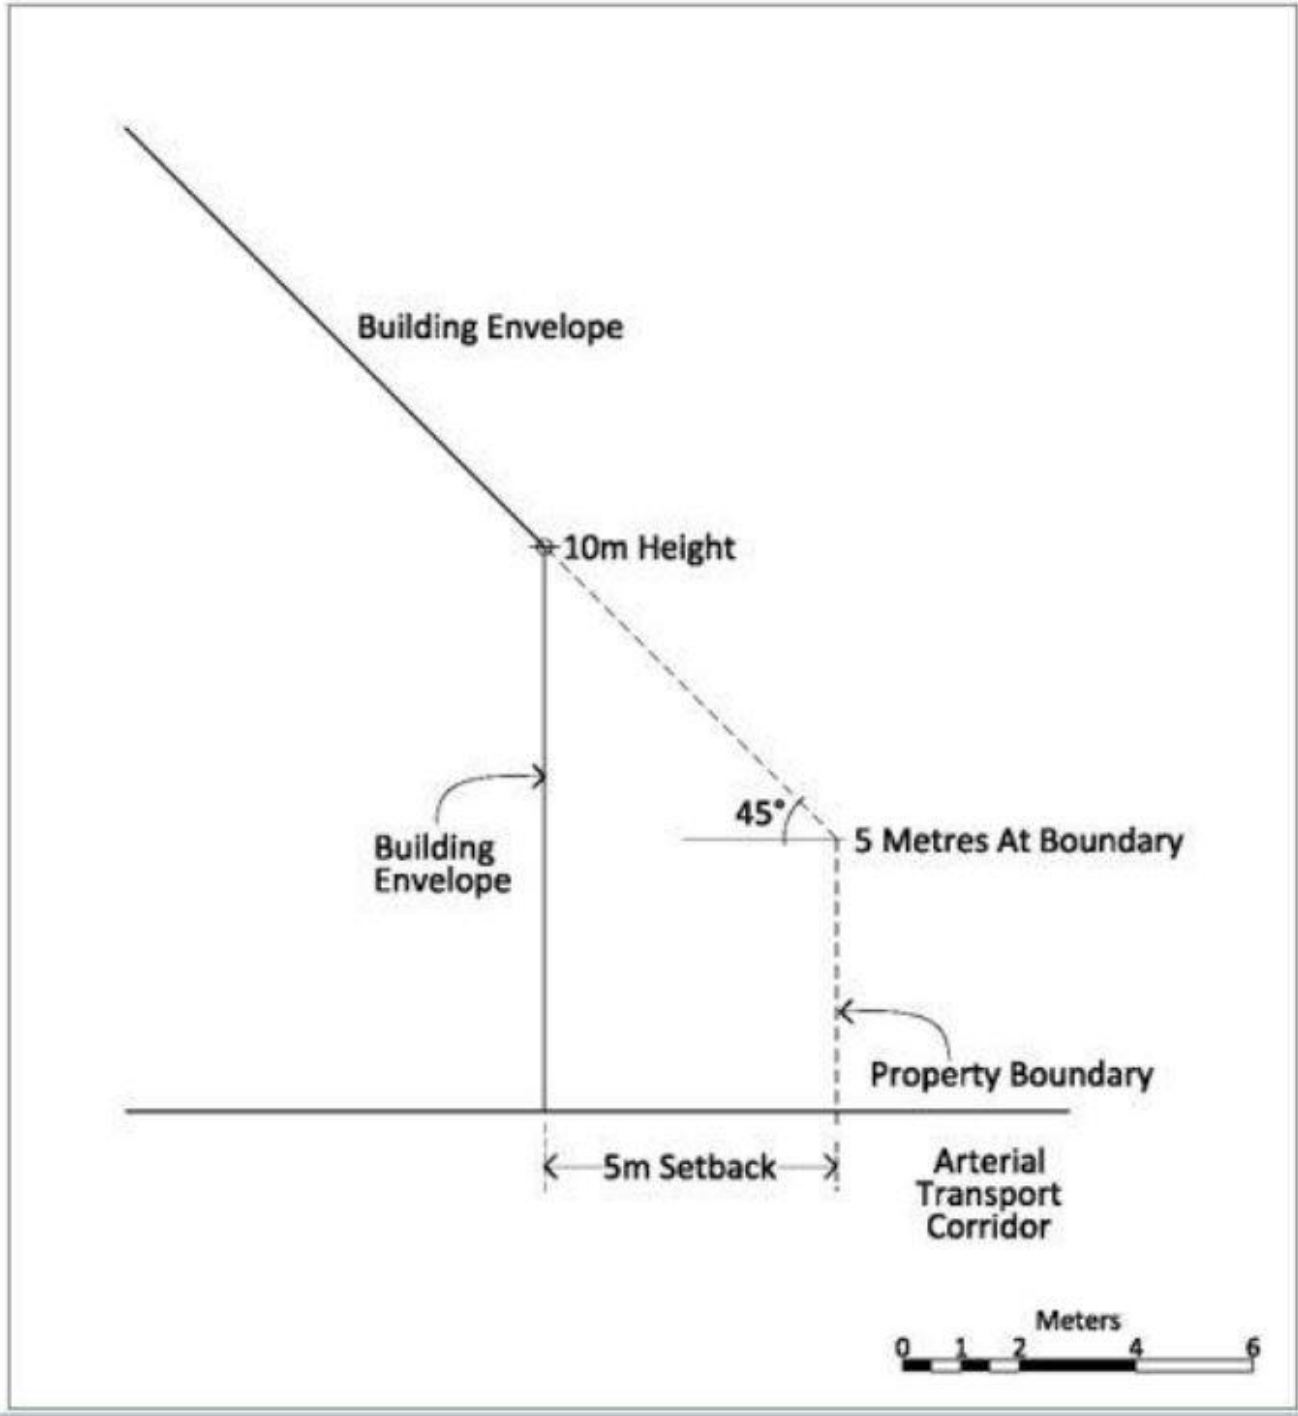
Building envelope for buildings located on an Arterial Transport Corridor
